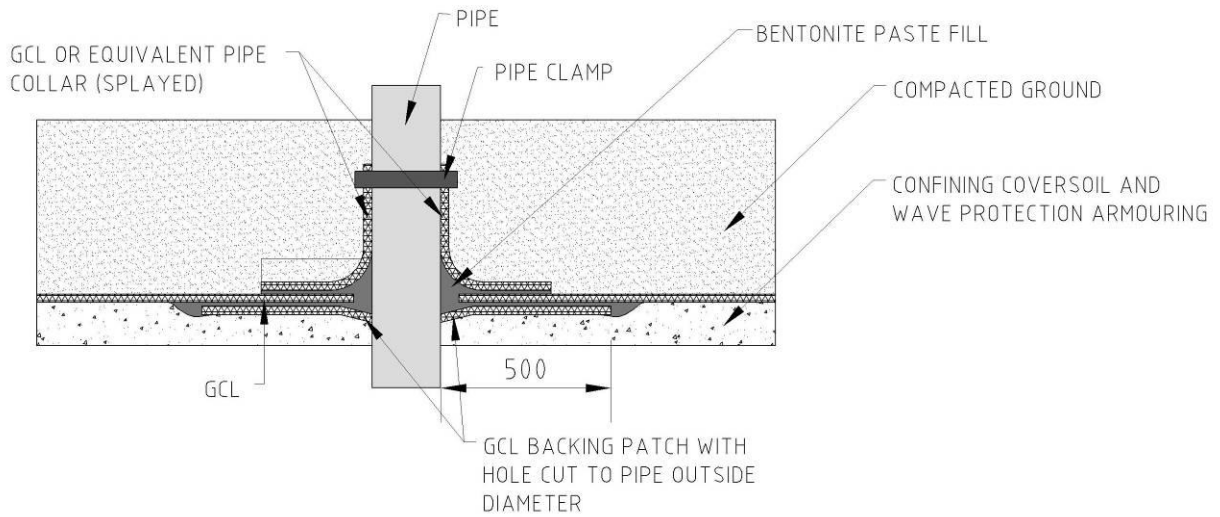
Typical GCL penetration detail (pipe penetration shown).
